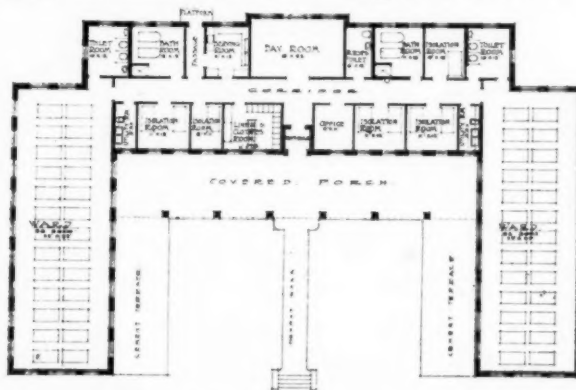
Floor plan of the model infirmary building to be erected at Alton State Hospital and Dixon institutions. The plan is similar to that of the cottages for tuberculars, except that the walls are of different construction. This single-storied structure will have cross ventilation in both directions.
